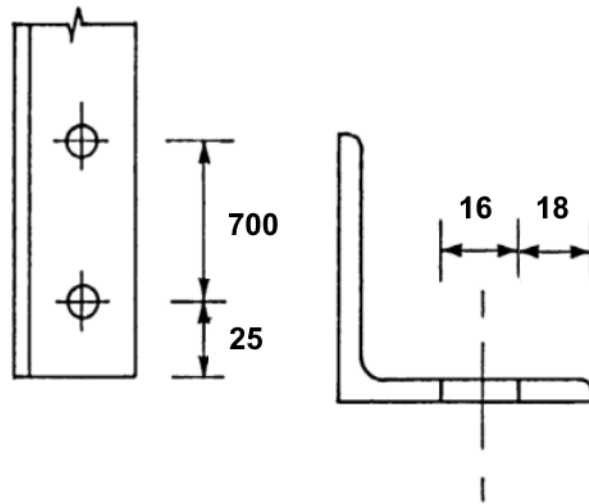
Span bolted joints construction details. Bolts are M14 grade 5.8 or higher on a 16 mm hole.
